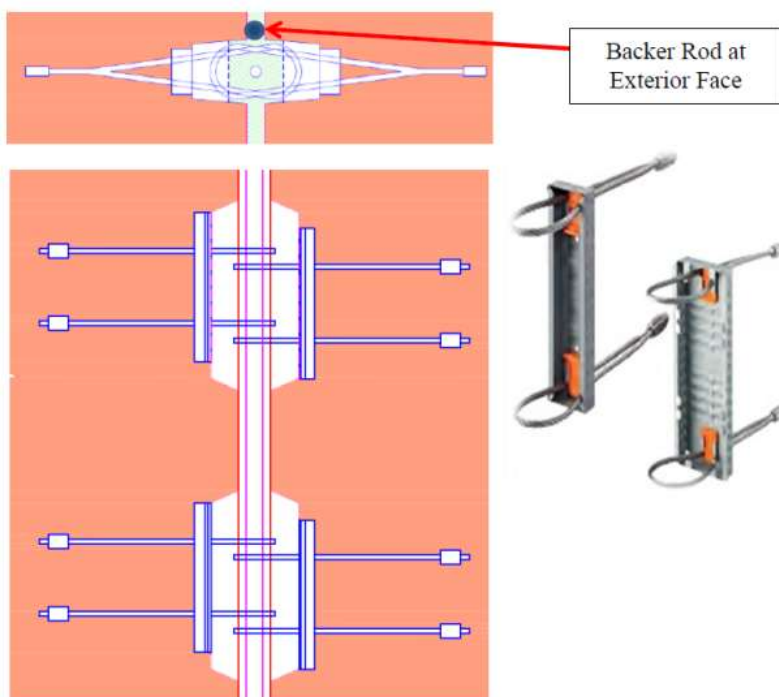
Pragati Towers–Typical Wall-to-Wall Vertical Loop Connection
